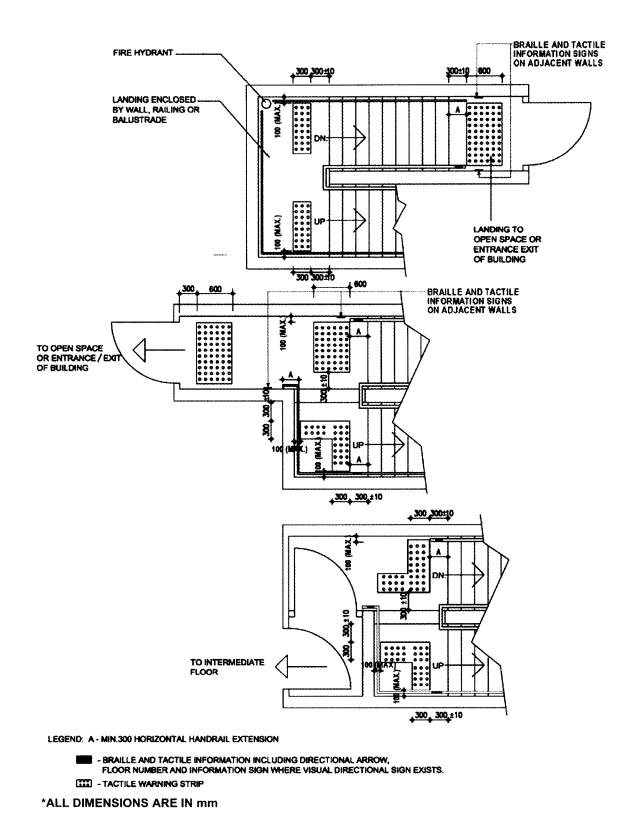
Arrangement of Tactile Warning Strips and Handrails at Staircases
